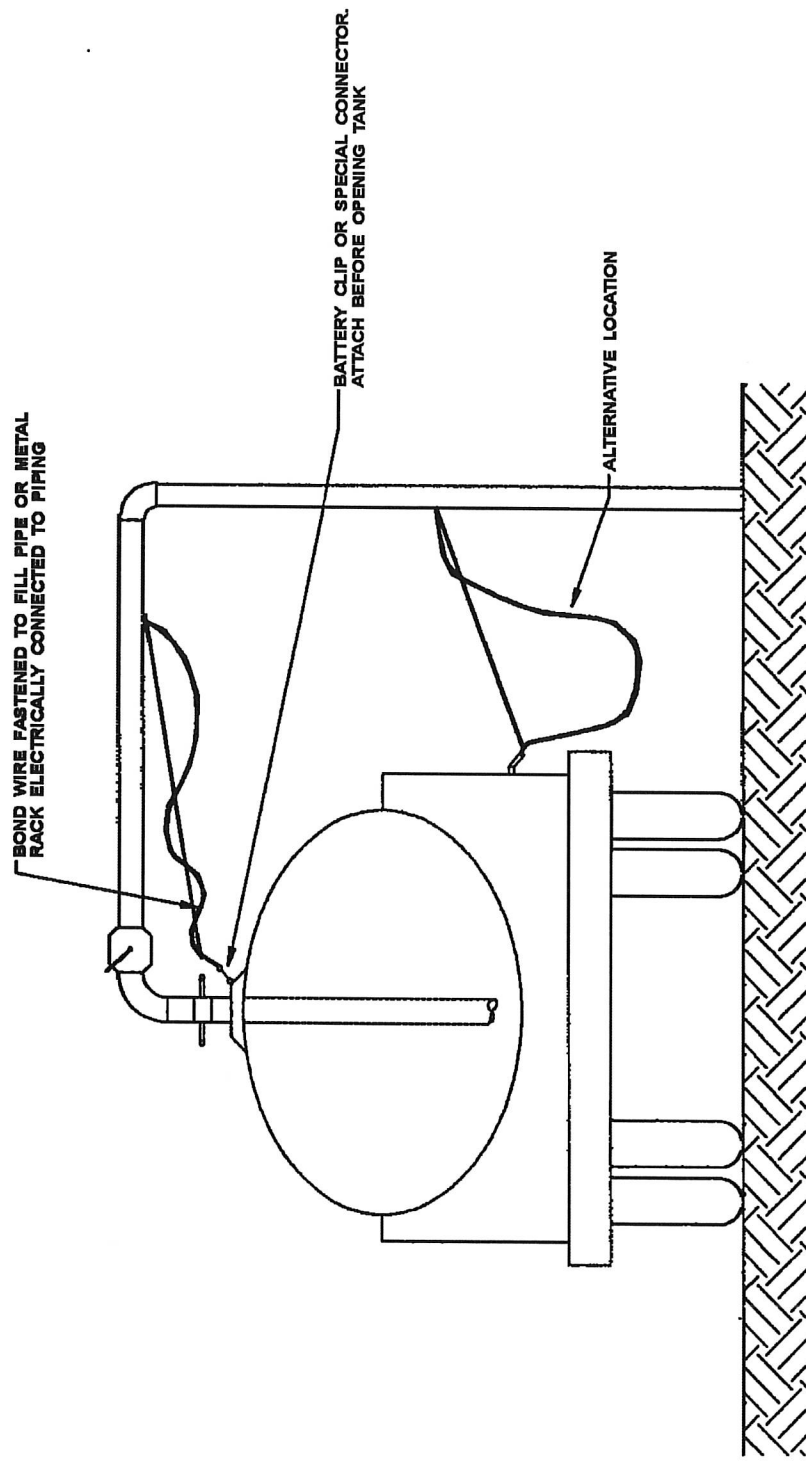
Grounding Connections for Tank Truck Stations
